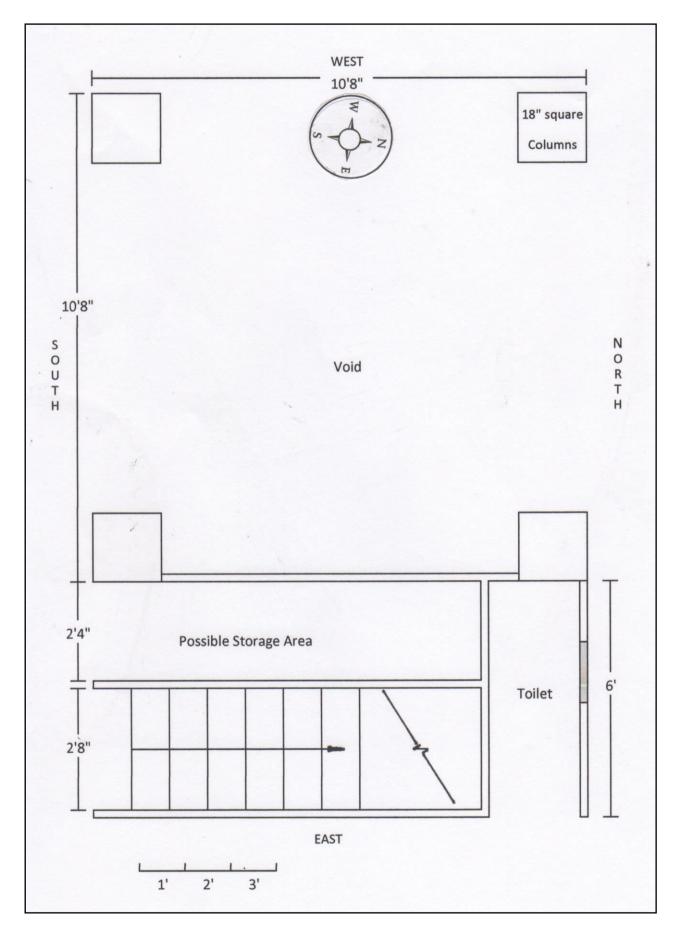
Ground floor plan of Mount Stewart's Quadrant Shelter
